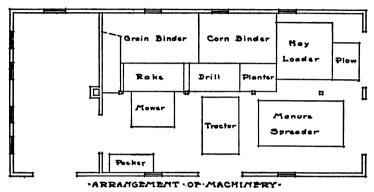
Floor plan of implement shed showing spacing for machines.
